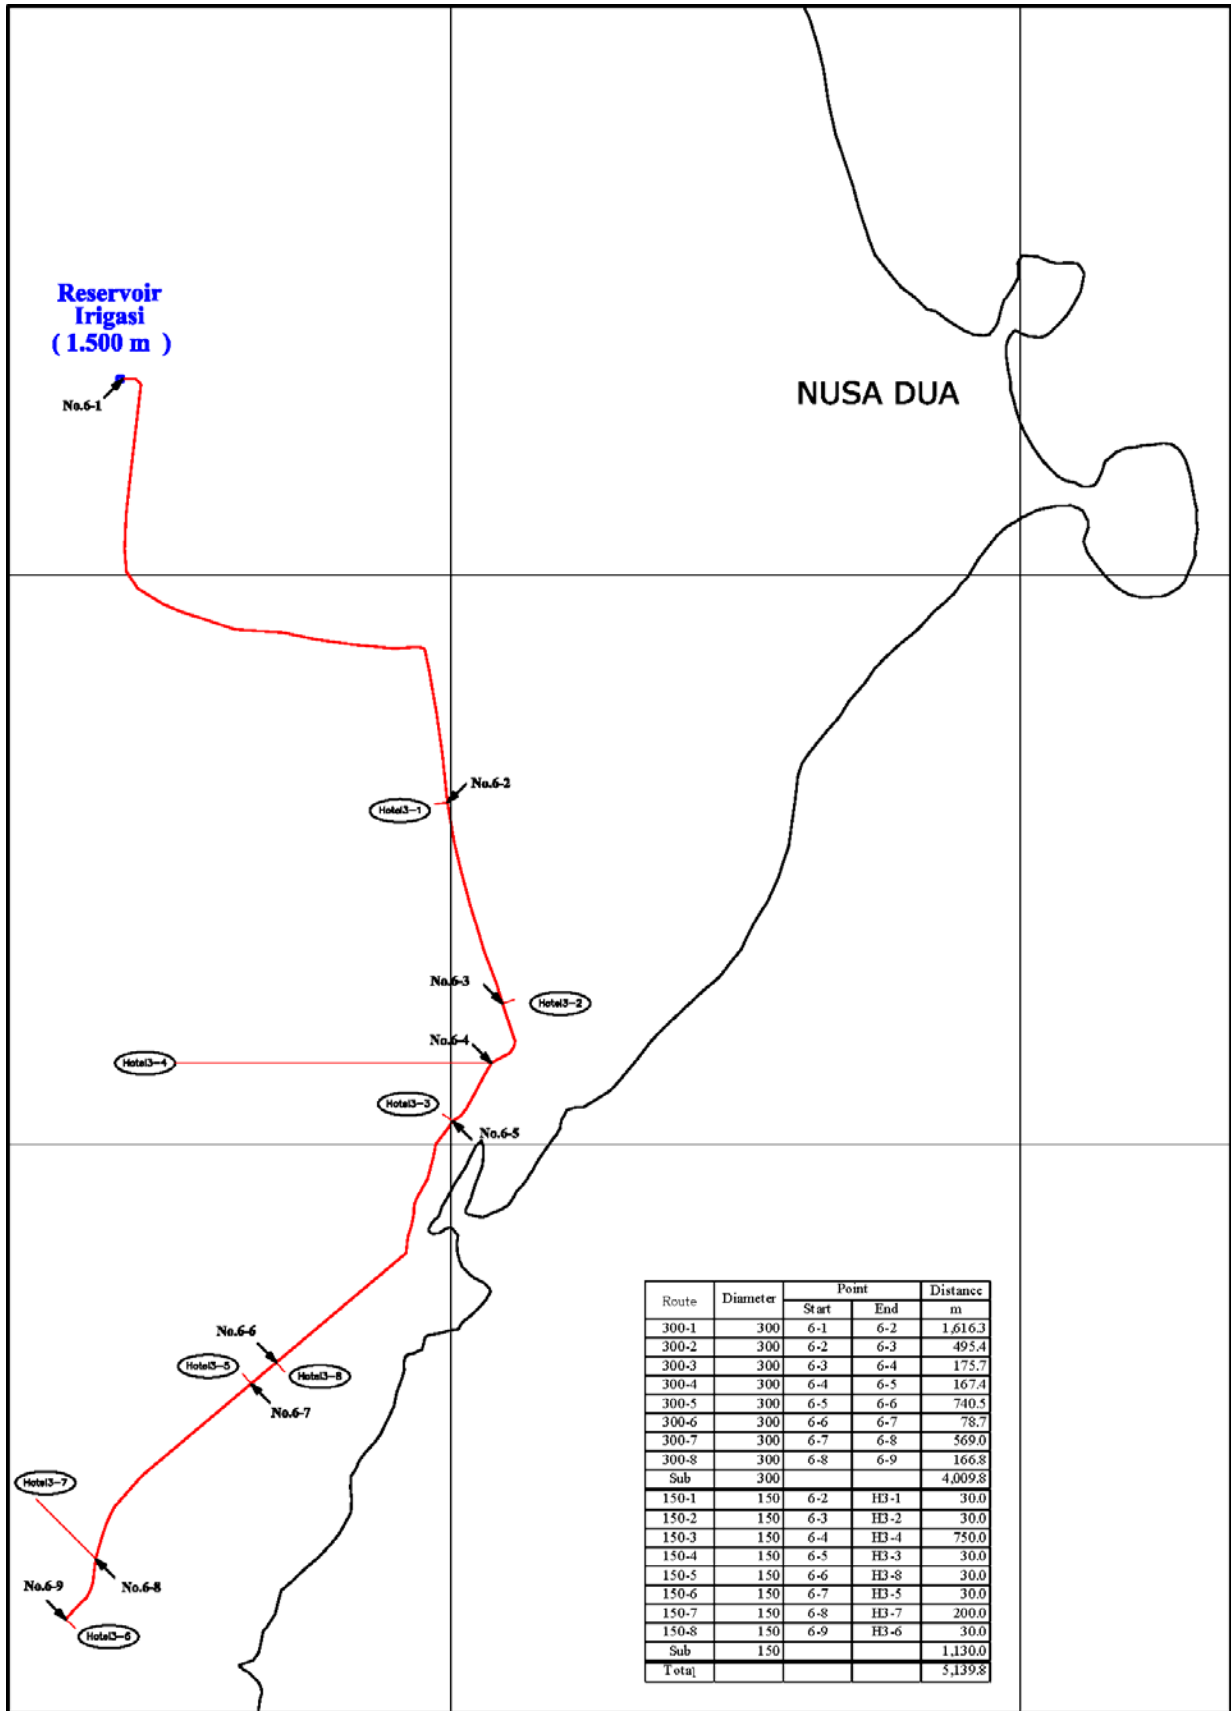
Plan of Distribution Pipe in Sawangan Area
